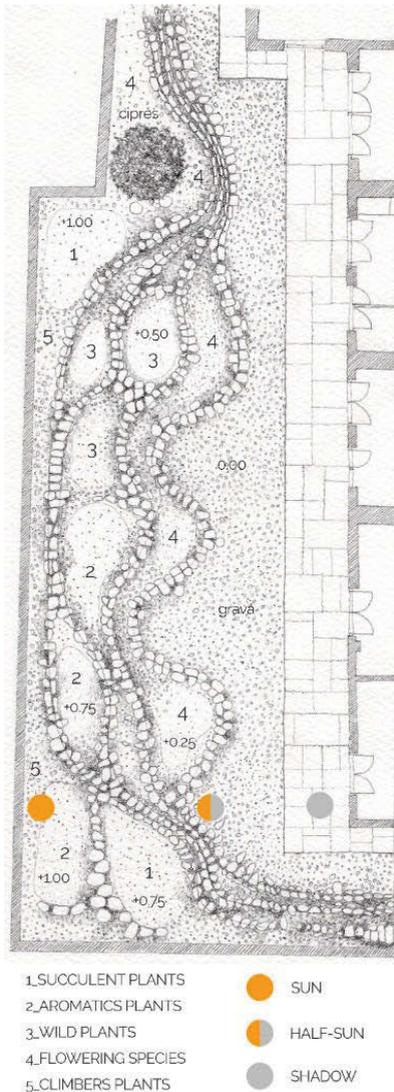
Sketch of the garden proposal (LiPuma, 2021)
